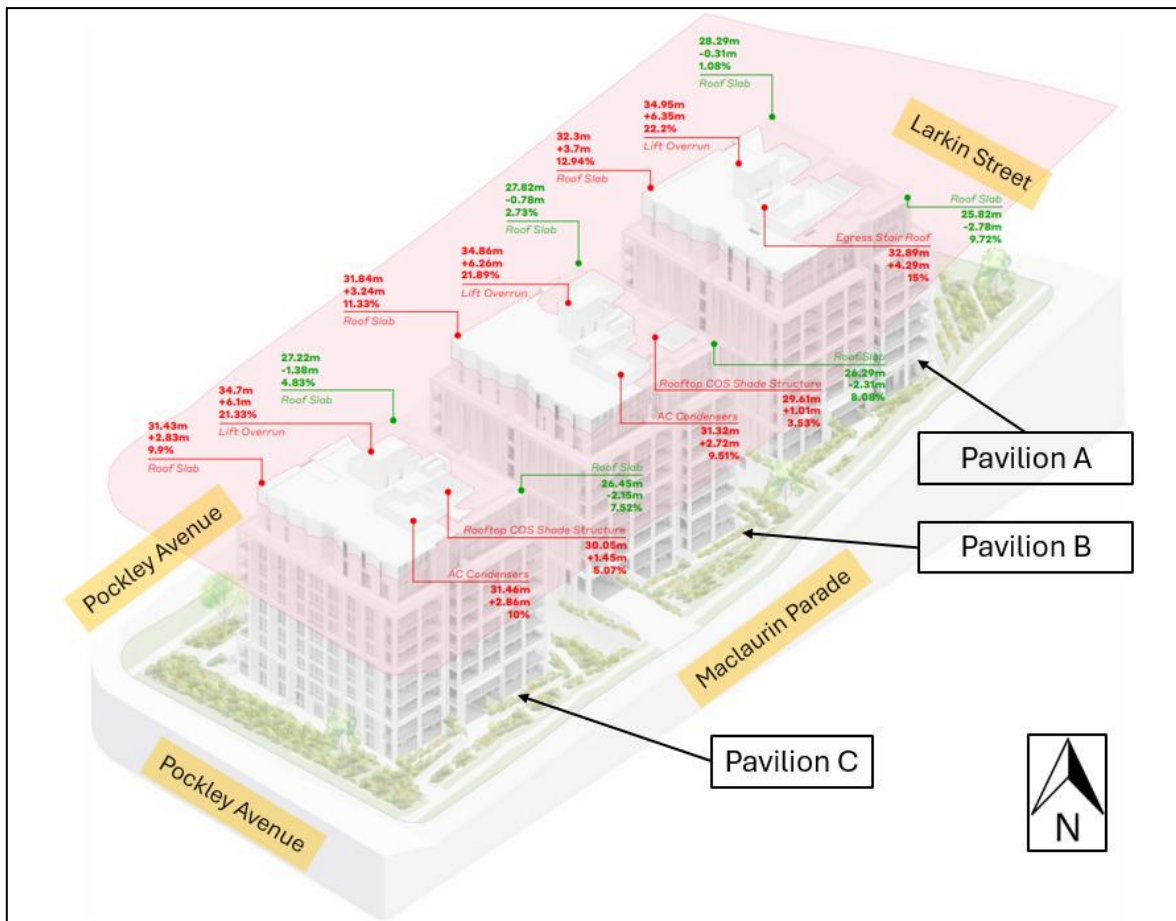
| Rooftop elements protruding above the maximum permissible height plane (Source: Amendment Report)
